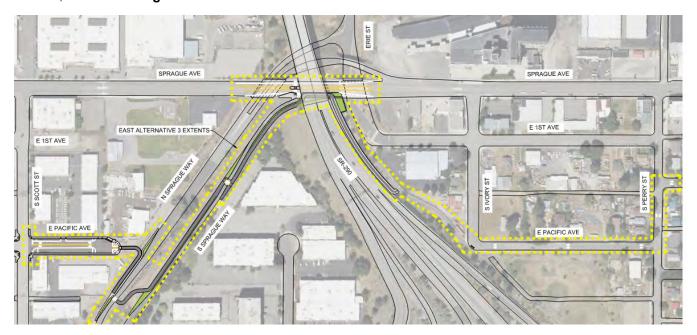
East Alternative 3 S Sprague Way Proposed Layout
